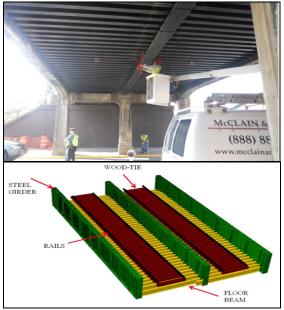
Instrumentation and Finite Element (FE) model for the Mainline MP 15.95 Bridge.
